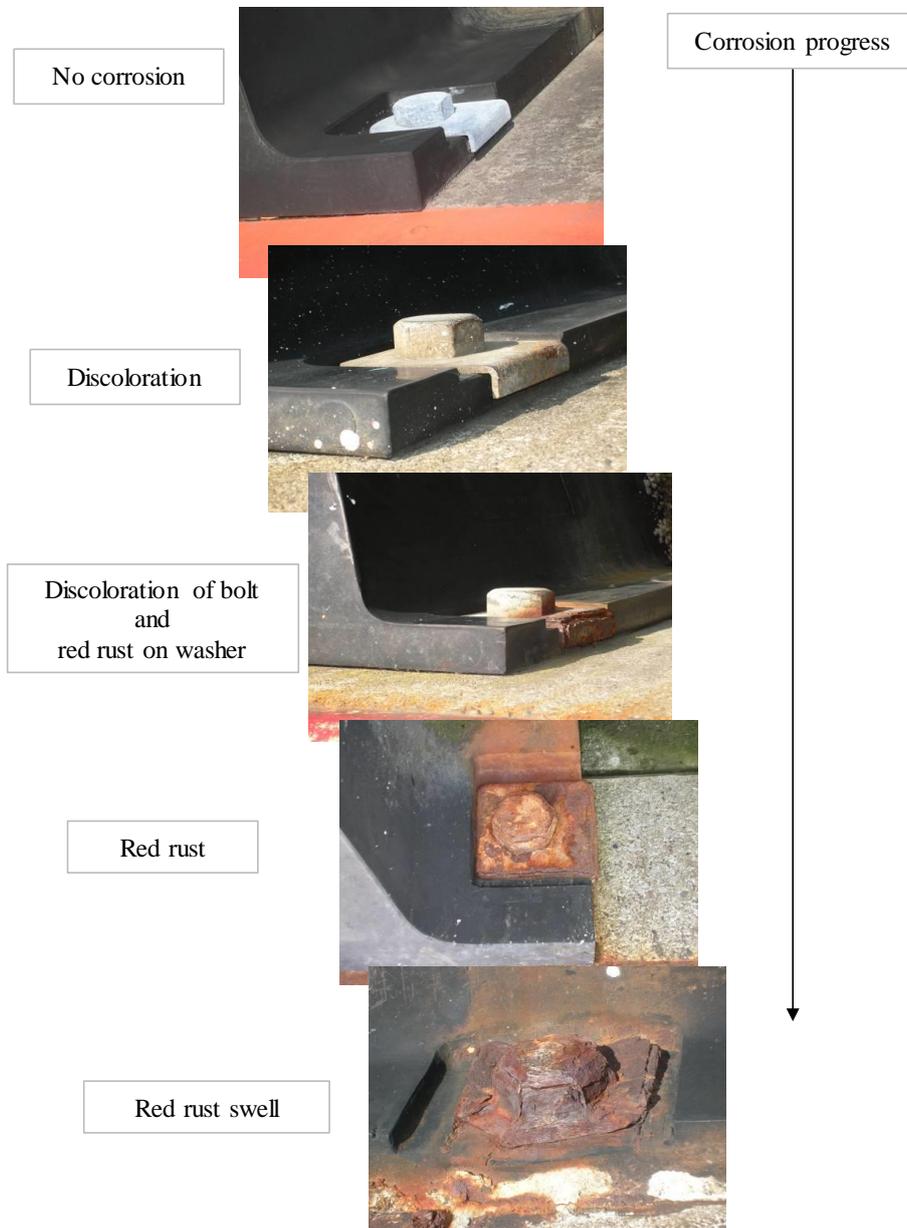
Corrosion of fixing bolt (Accessories)
